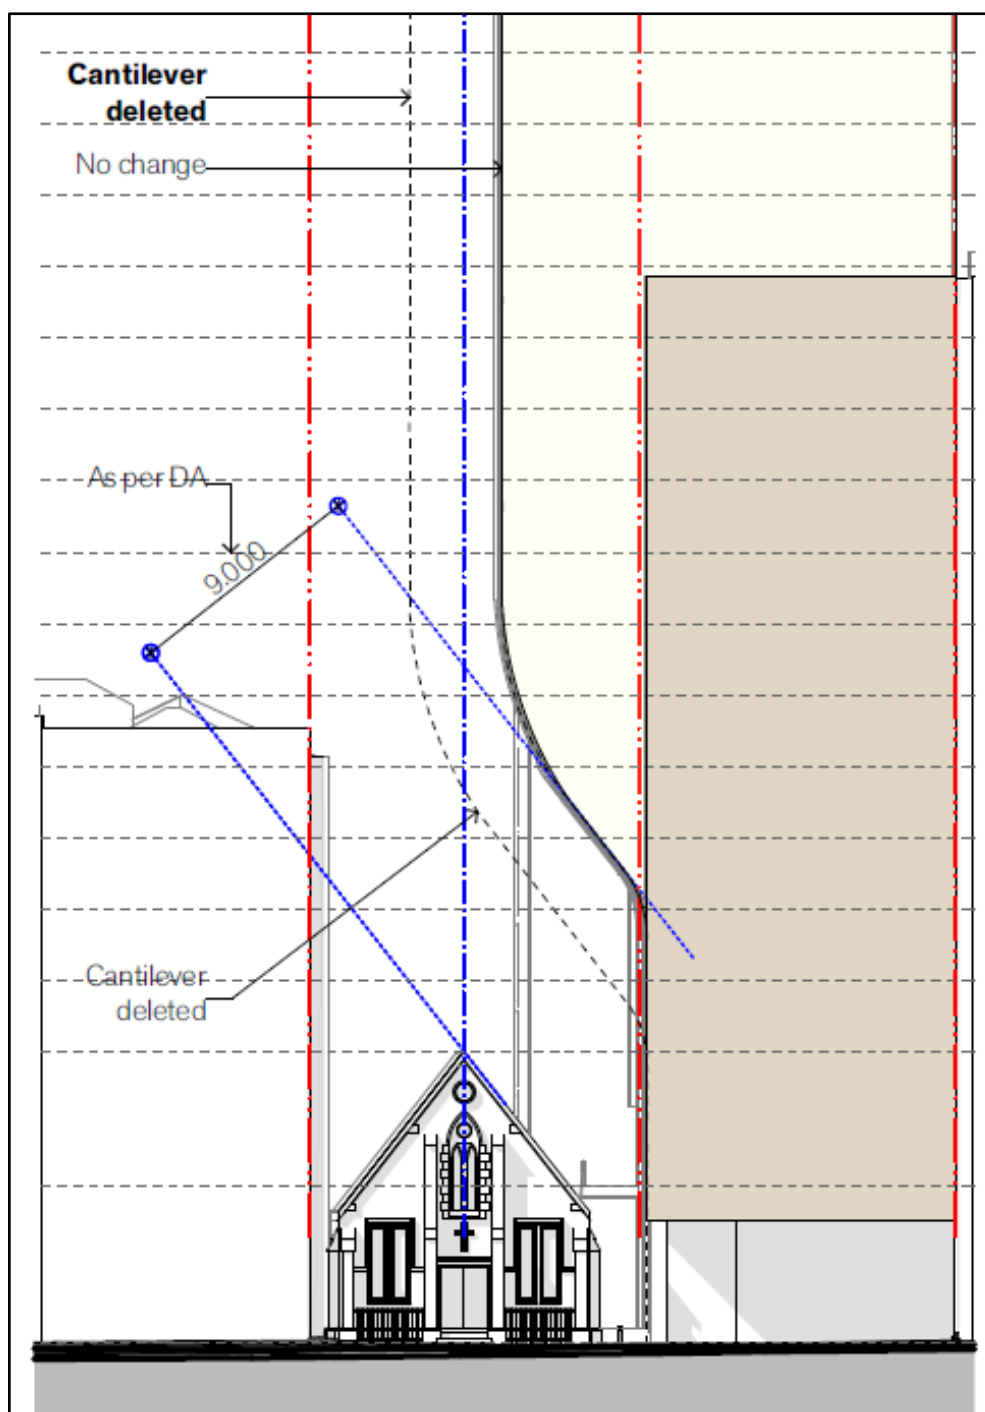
Kent Street elevation and the extent of the modulated cantilever as originally proposed.
